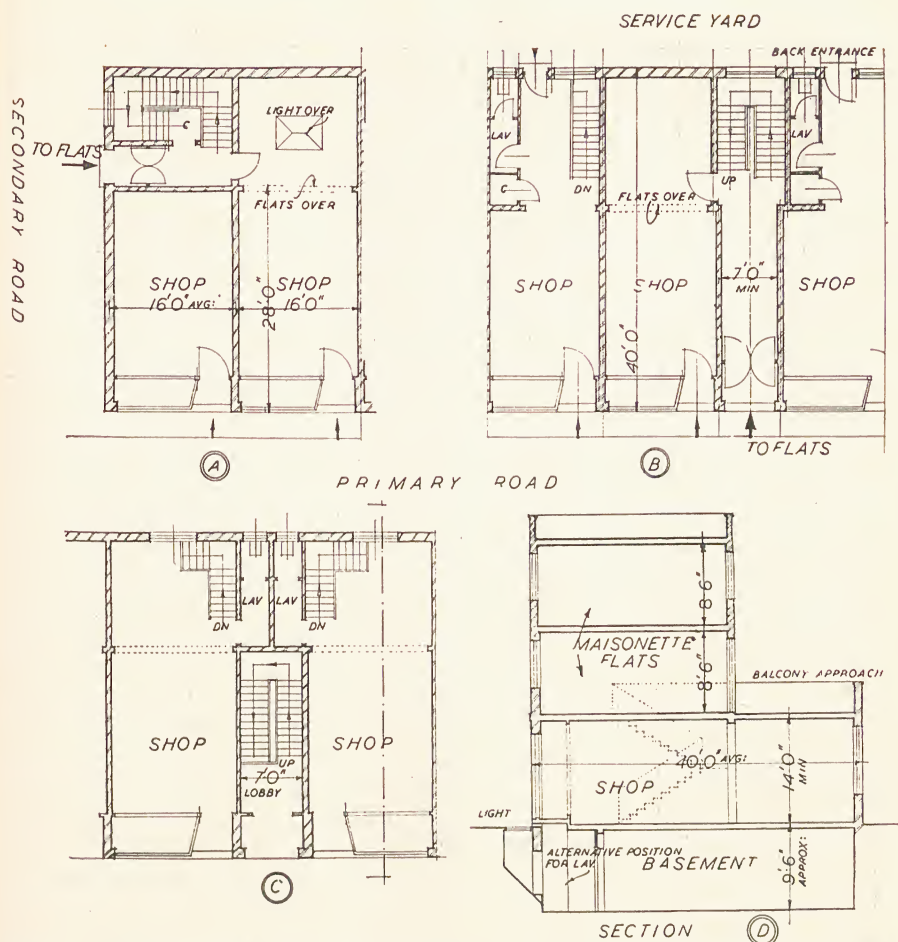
SHOWING SPACING OF SHOPS, ENTRANCES, ETC., IN A TYPICAL SUBURBAN TYPE OF DEVELOPMENT
